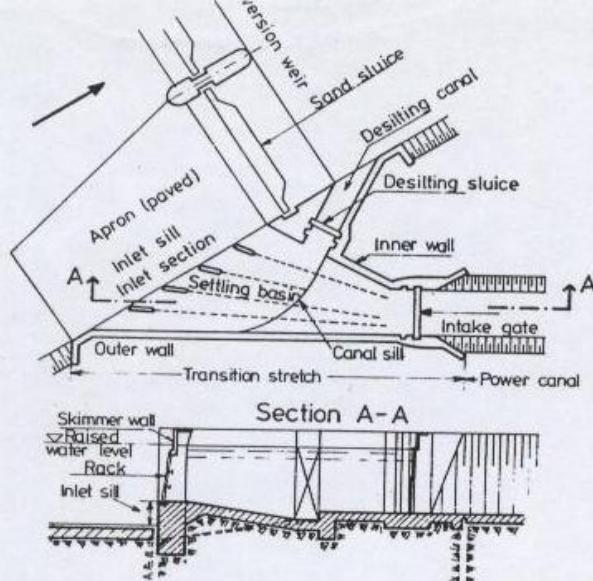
/20. Canal intake on rivers carrying heavy bed load
